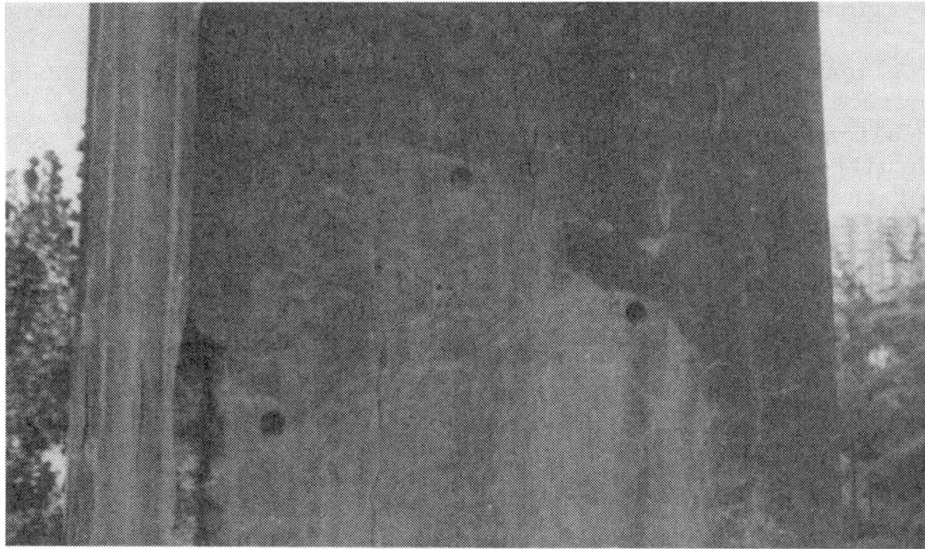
Column of the Central Arch, facing the south. Cracking aligned with the main reinforcing bars
